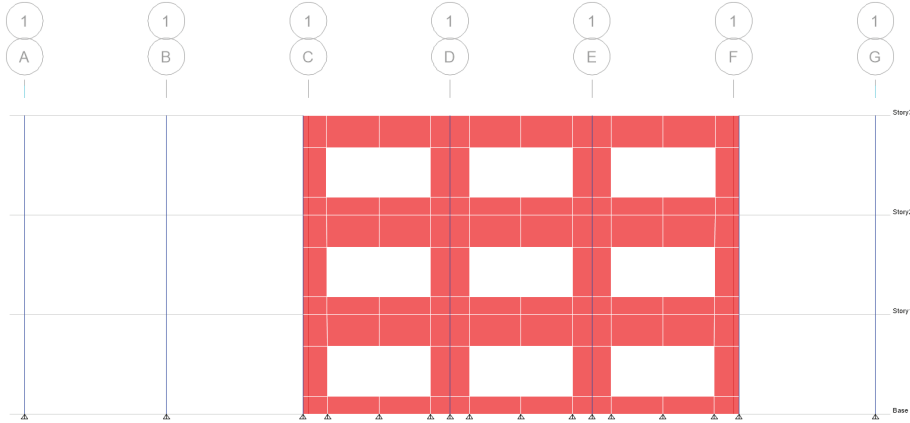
ETABS model for Shear Wall Pattern No. 1.
